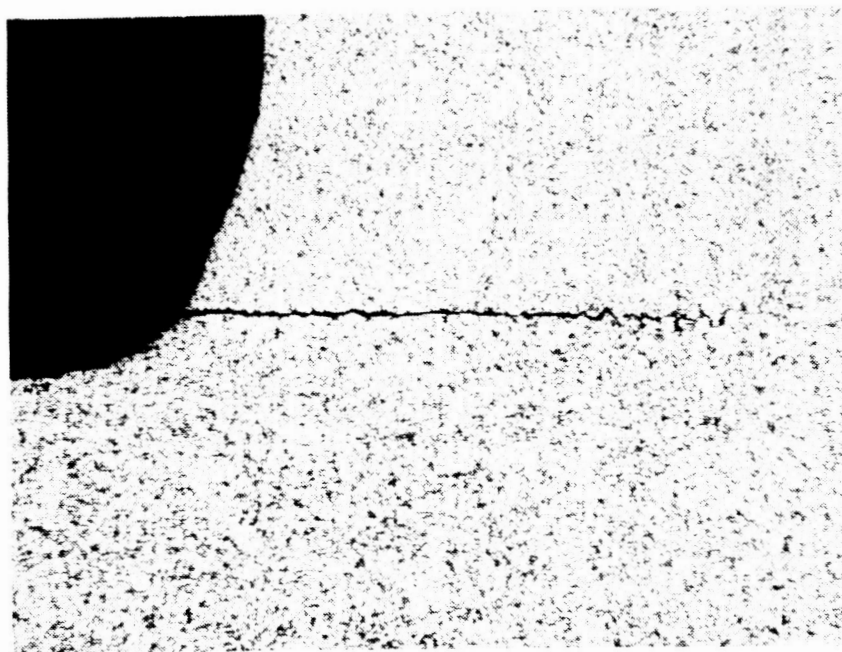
Crack in Bond Adhesion Test B-2 of Panel F
